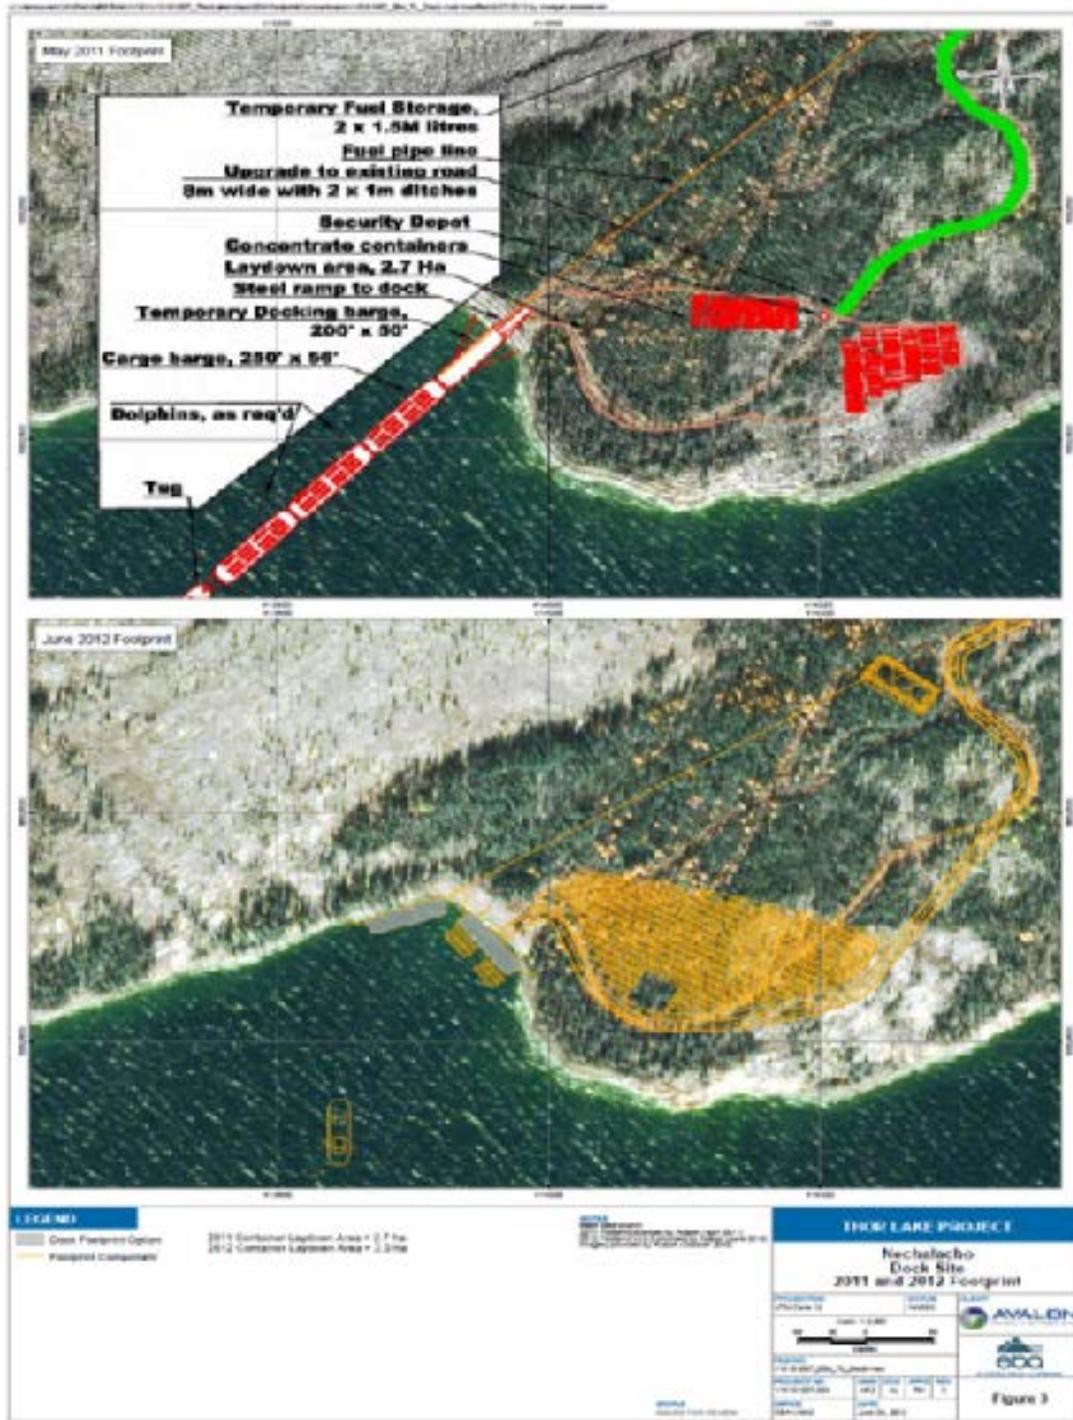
Nechalacho dock site showing original and modified footprint. (PR#165 p. 9)
